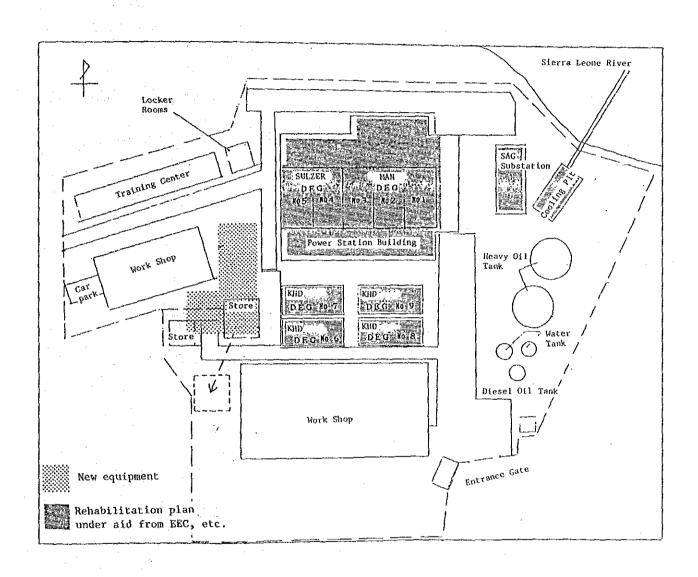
Present Status and Future Plan of General Layout at Kingtom Power Station
